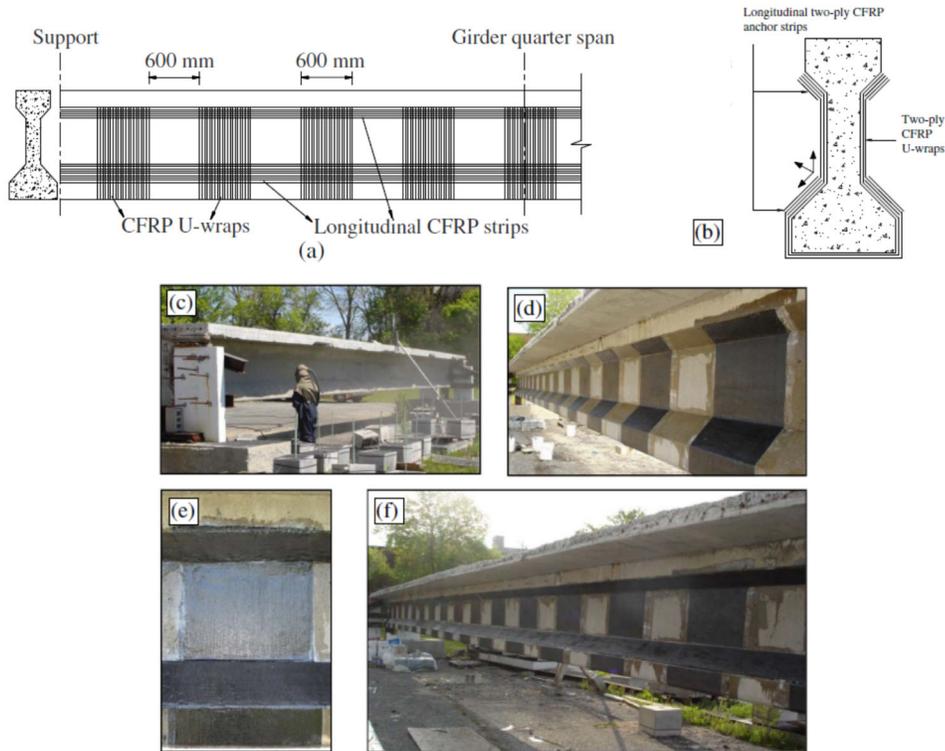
Repair scheme used for shear strengthening of the damaged girder: (a) along girder elevation (b) on the cross-section (c) sand blasting (d) application of the first CFRP layer (e) application of the longitudinal CFRP strips (f) final rehabilitated girder [12]
